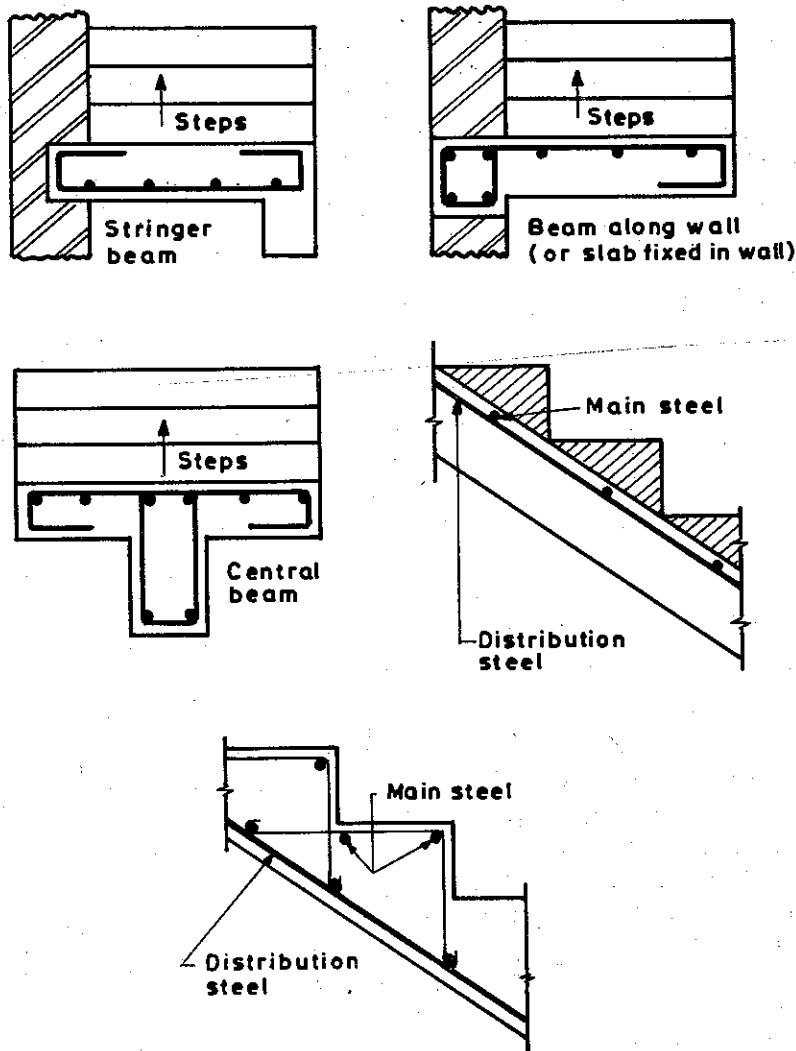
Types of stairs spanning transversely and detailing of steel in them.
